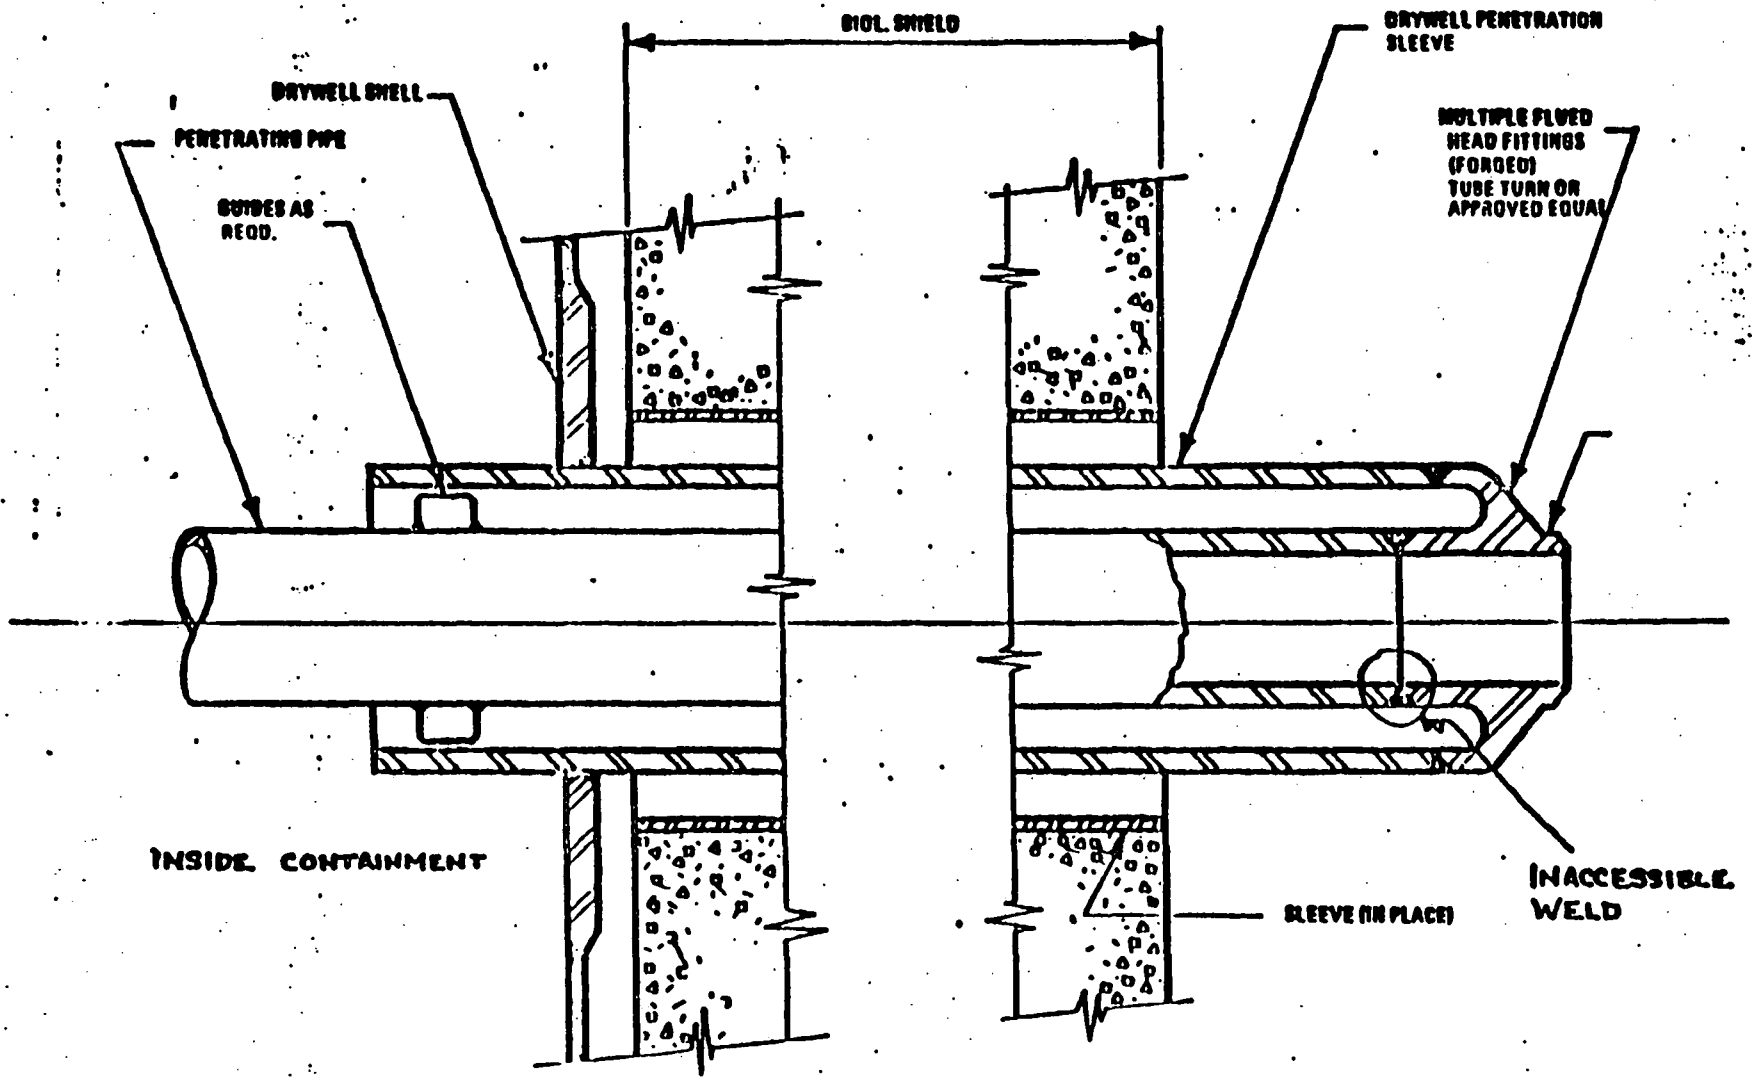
Center Section—Cold Fluid Piping Penetration Assembly
